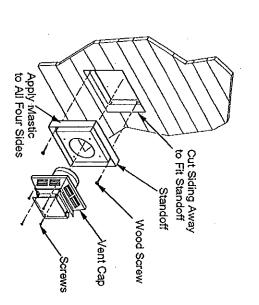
Installing Siding Standoff (Combustible Exterior Wall)
